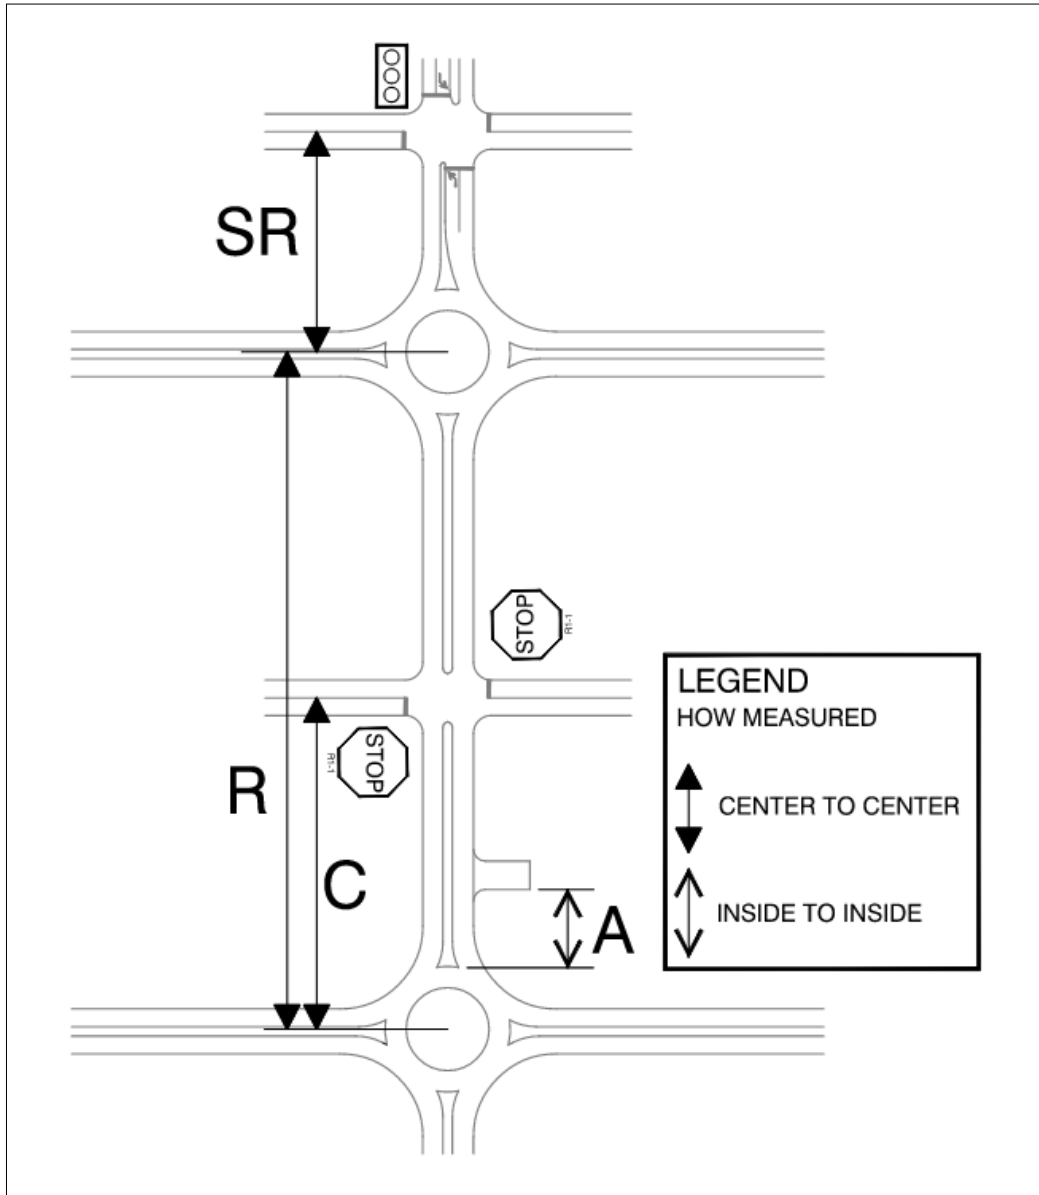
Minimum Street and Access Connection Spacing for Single-Lane Roundabouts
